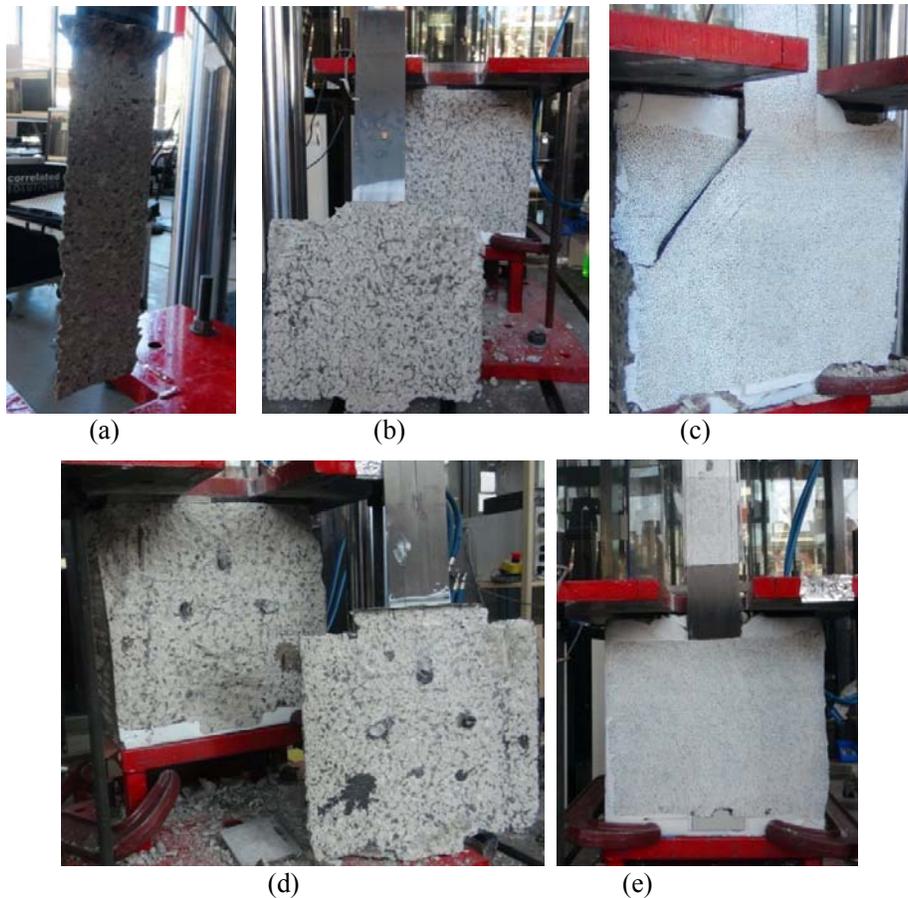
Summary of failure modes (a) Type 0 Control specimen – Concrete cover separation failure; (b) Type 1 - Patch anchor debond; (c) Laminate slippage Partial inter laminar/concrete separation failure; (d) Type 2 – Patch anchor debond + spike anchor rupture; (e) Laminate slippage;
